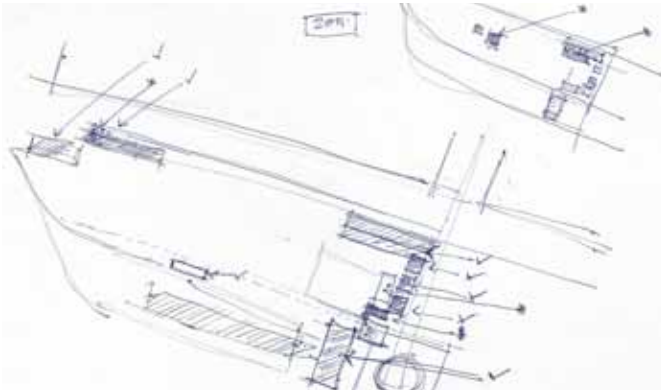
CURRENT SITE PLAN (AUTHOR, 2011)
